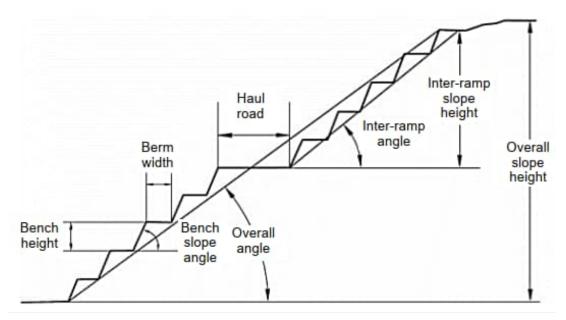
Schematic diagram of pit wall with slope design definitions
